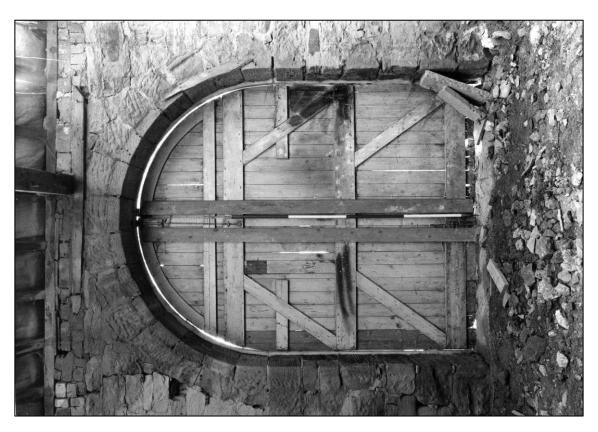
South coach opening in west wall of south room, looking W (photo 1/12) (top to left).
